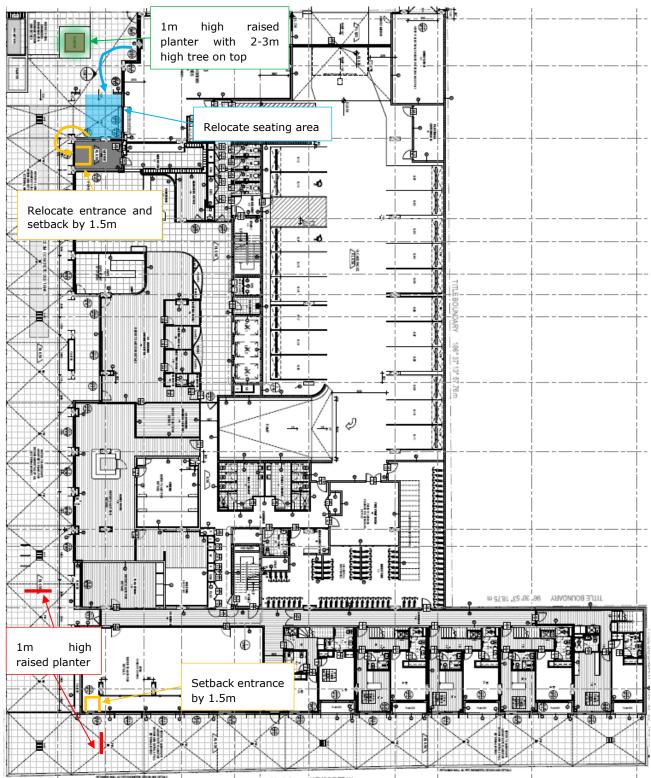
Recommended wind control measures overlaid on the ground floor plan.
